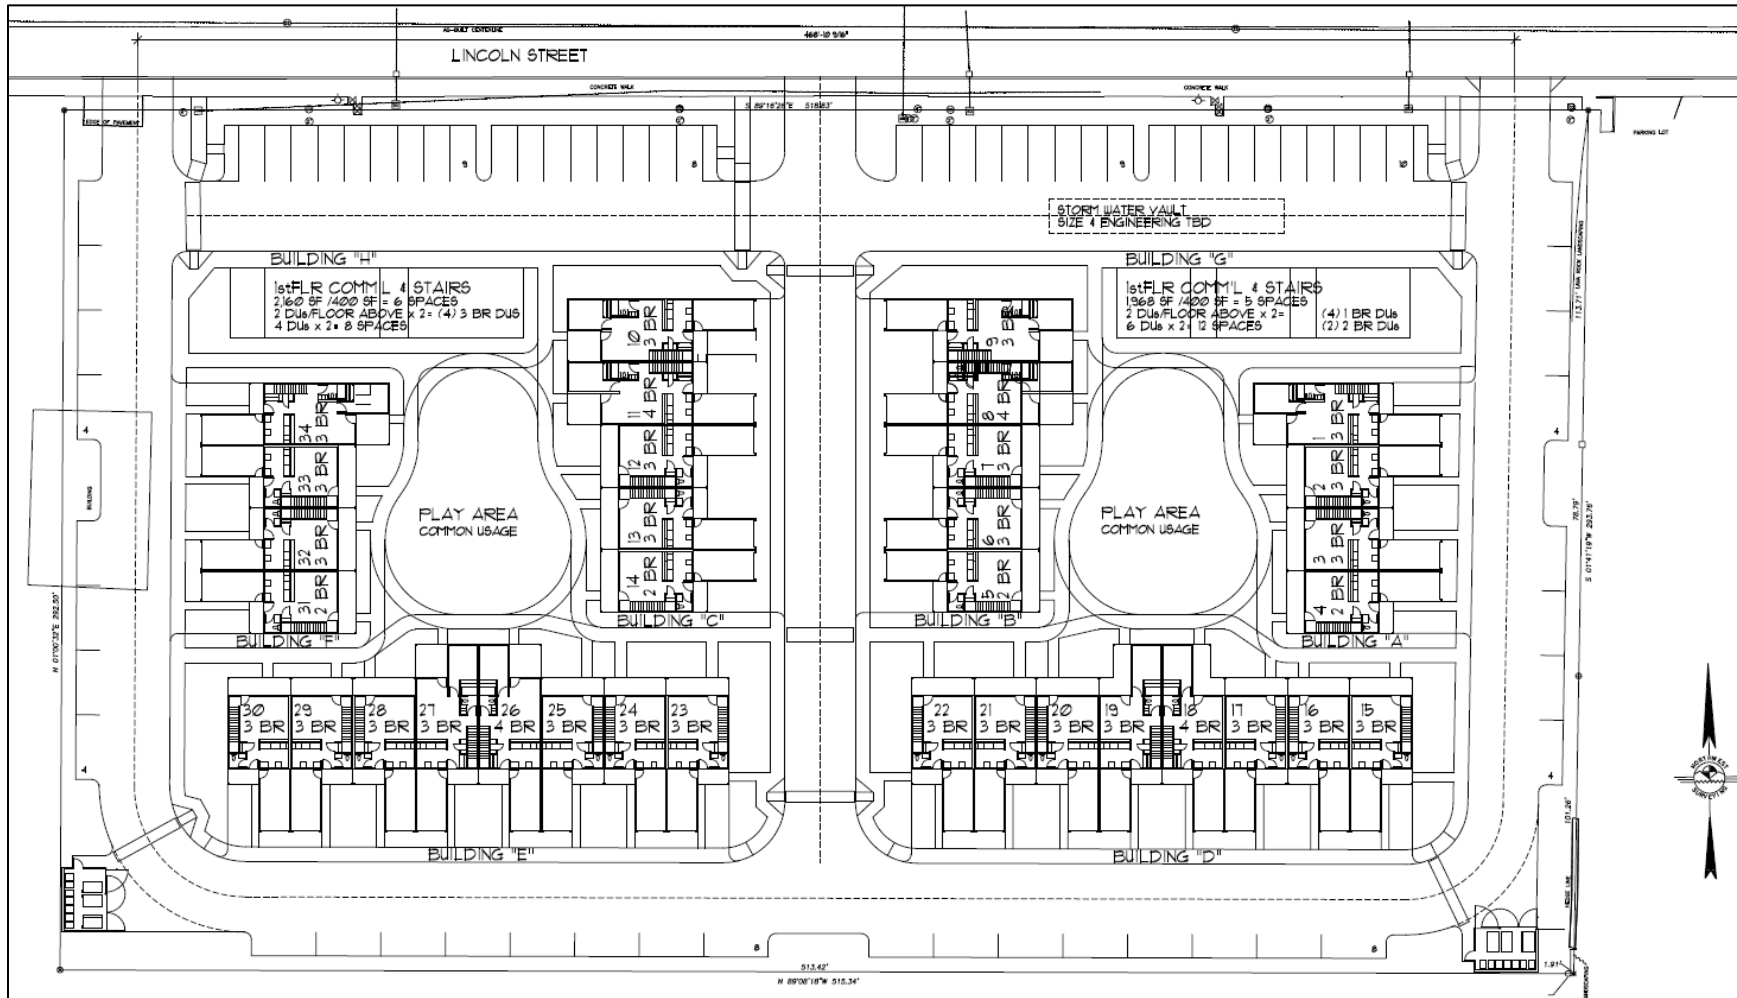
Proposed Site Plan of Habitat for Humanity Proposed Lincoln Street Development
